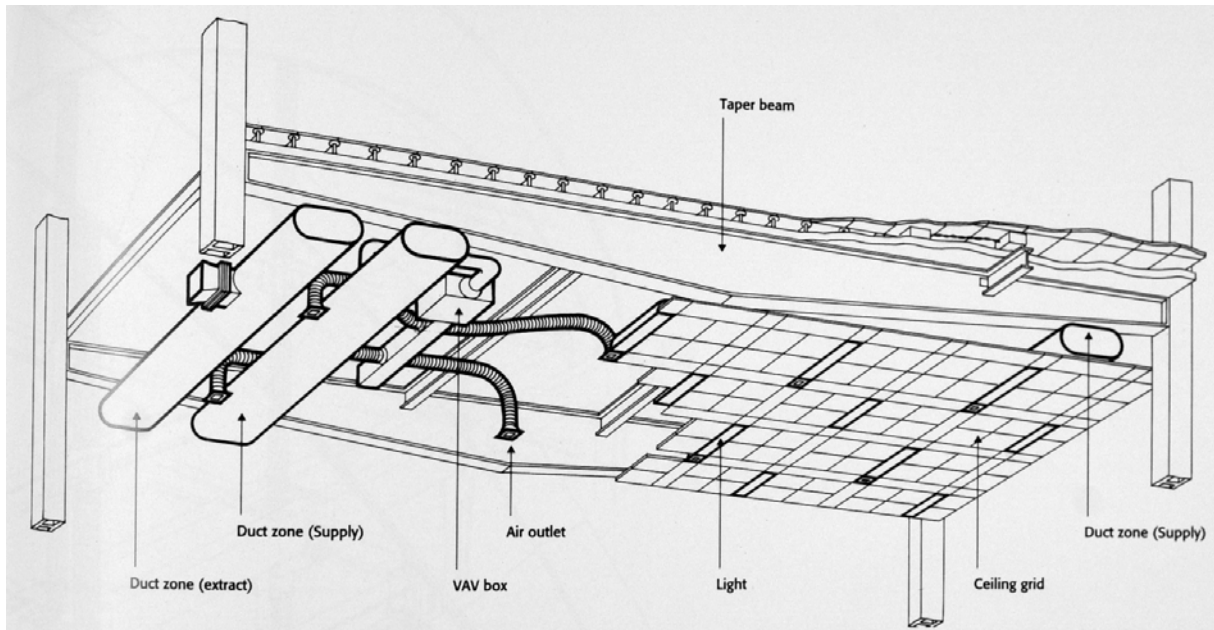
Complementary function integration between steel structural system and building services. Emabankment Place, London. Ove Arup & Partners, engineers. (Dunster)
